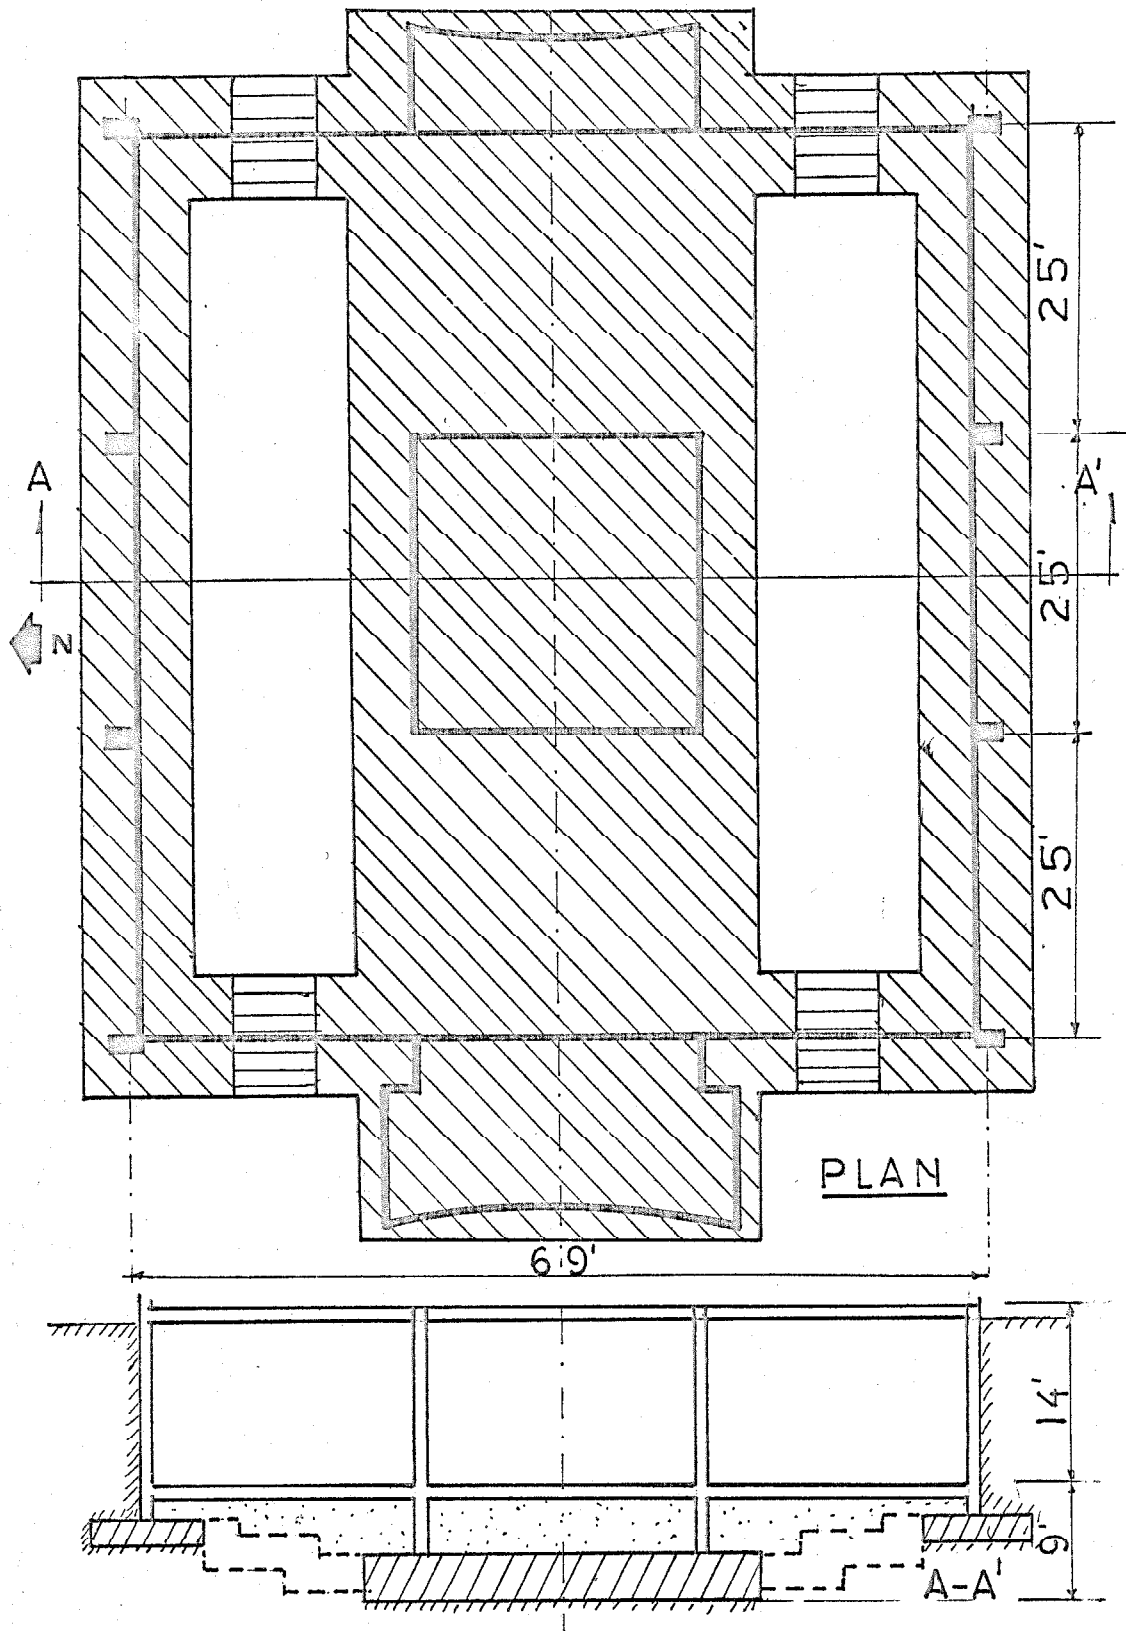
FOUNDATION PLAN AND A N-S SECTION
